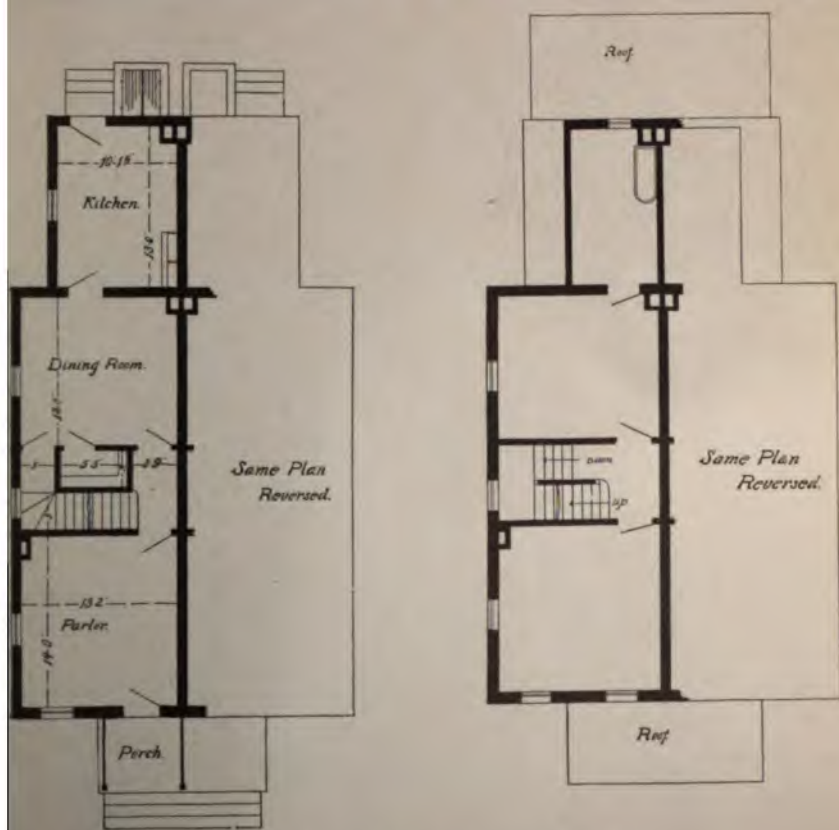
HOUSE FOR EMPLOYEES, PLAN F
